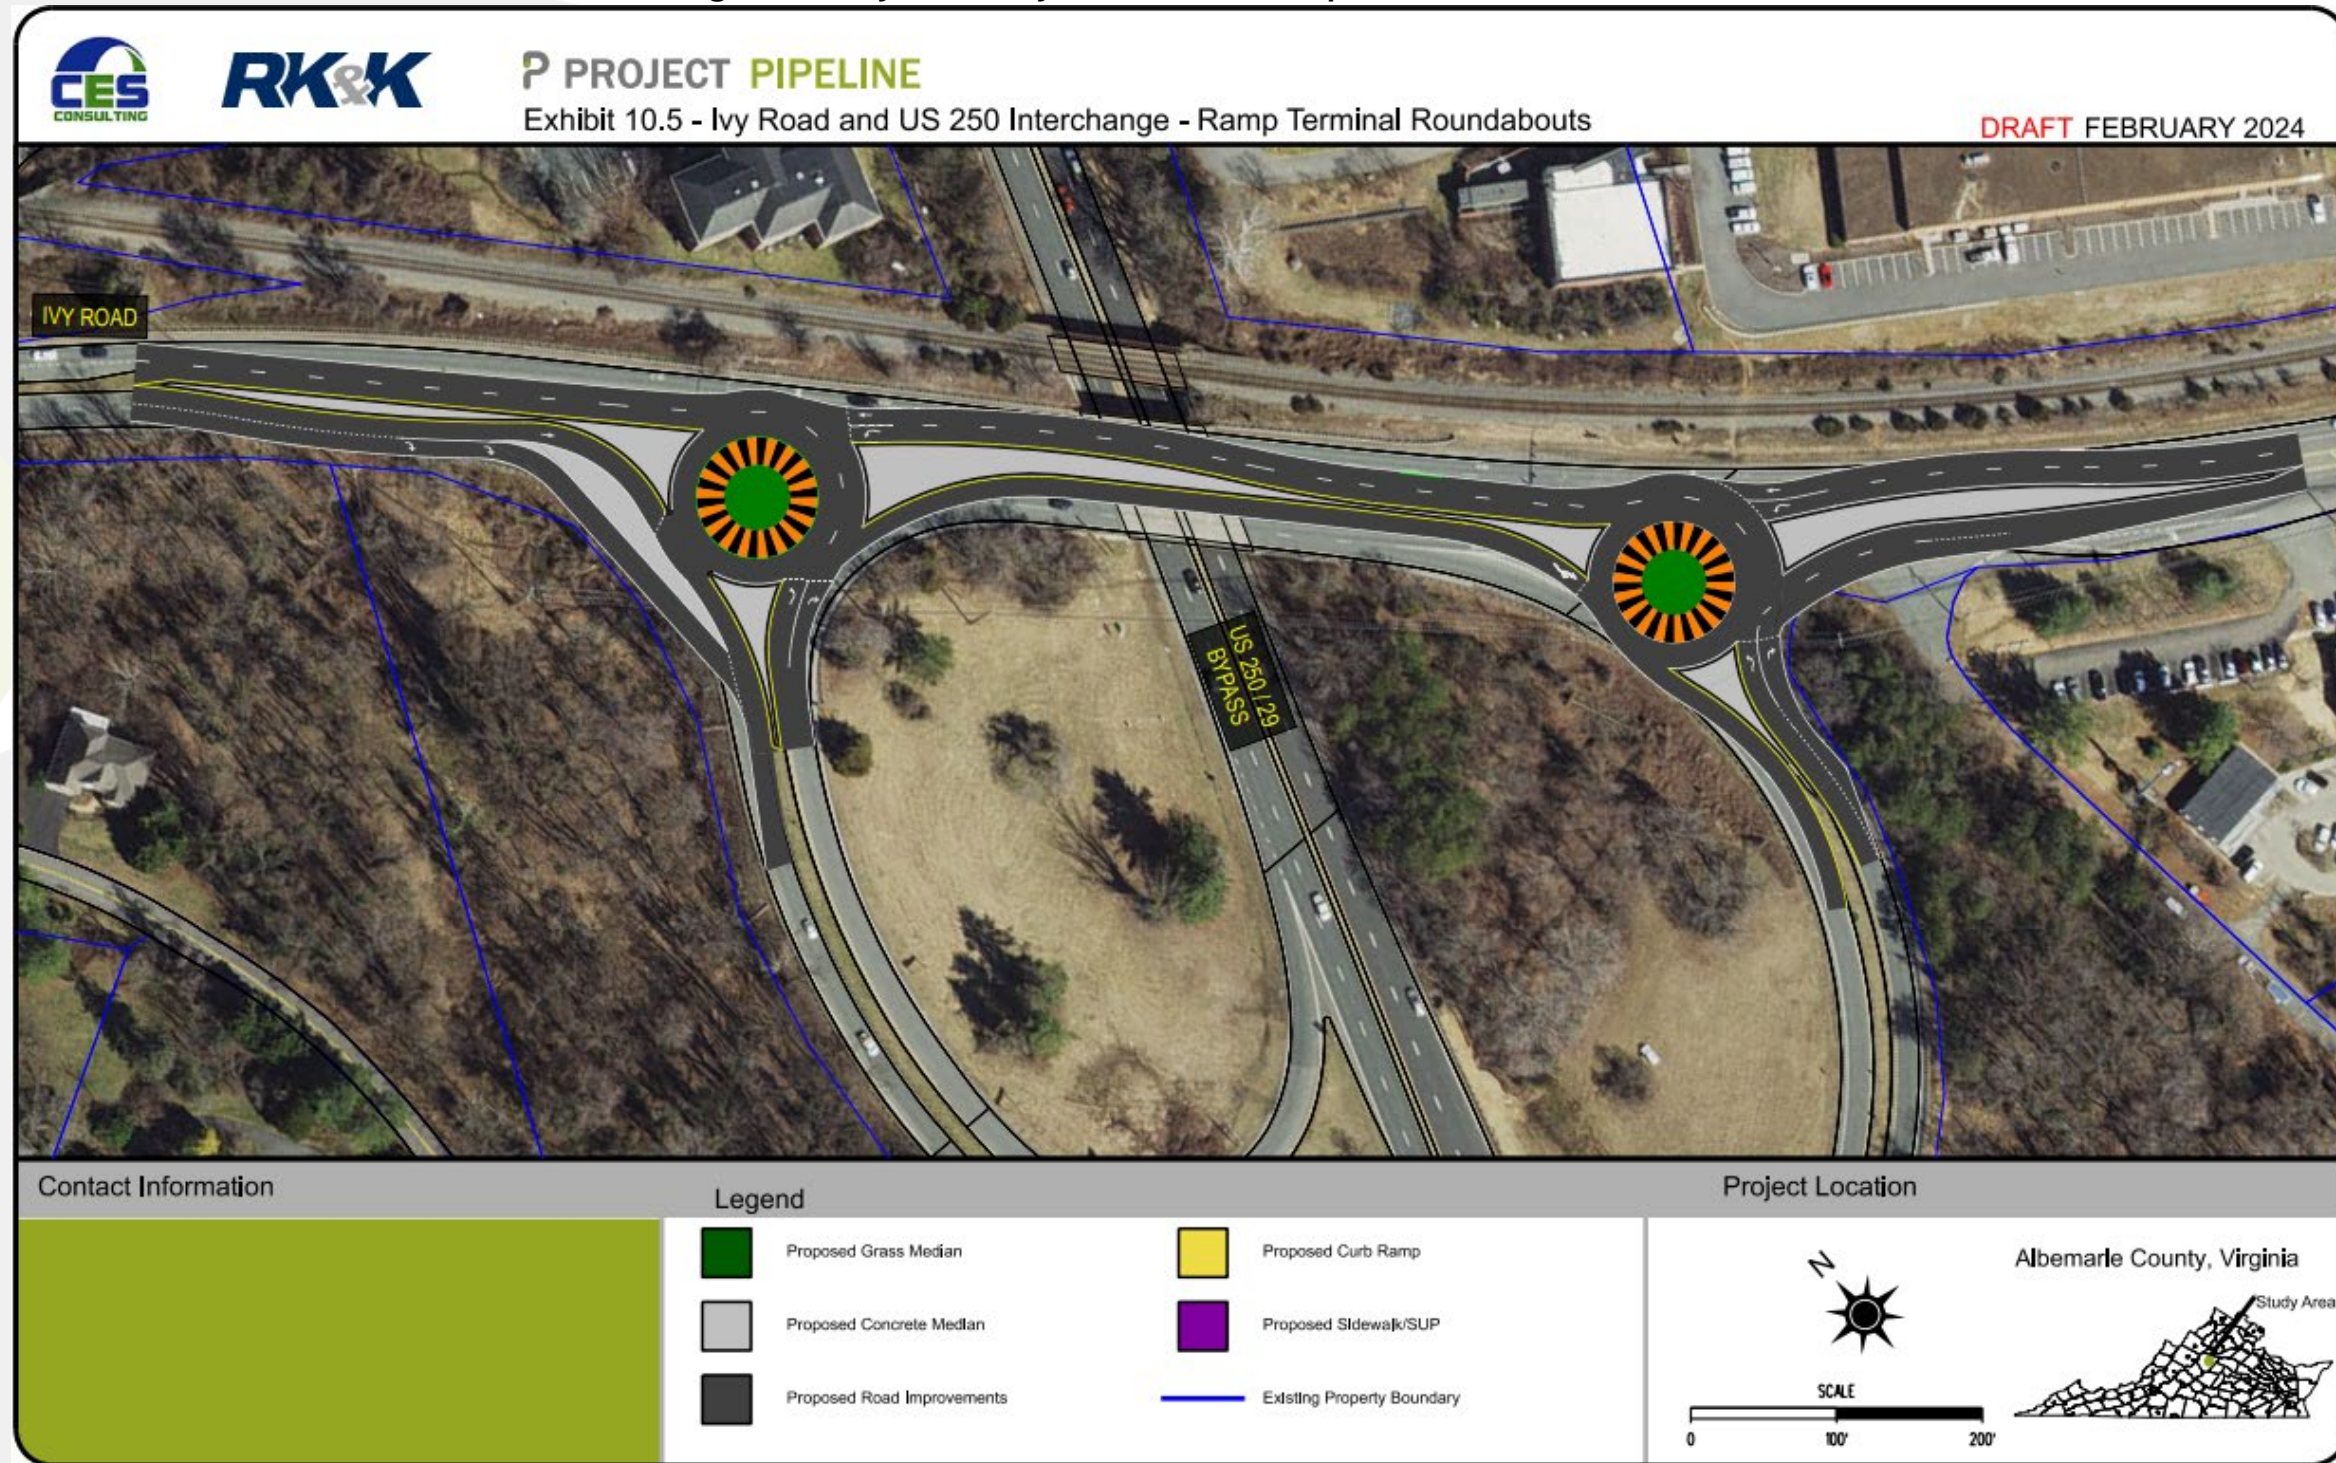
Ivy Road – Layout for US 250 Ramp Terminal Roundabouts
